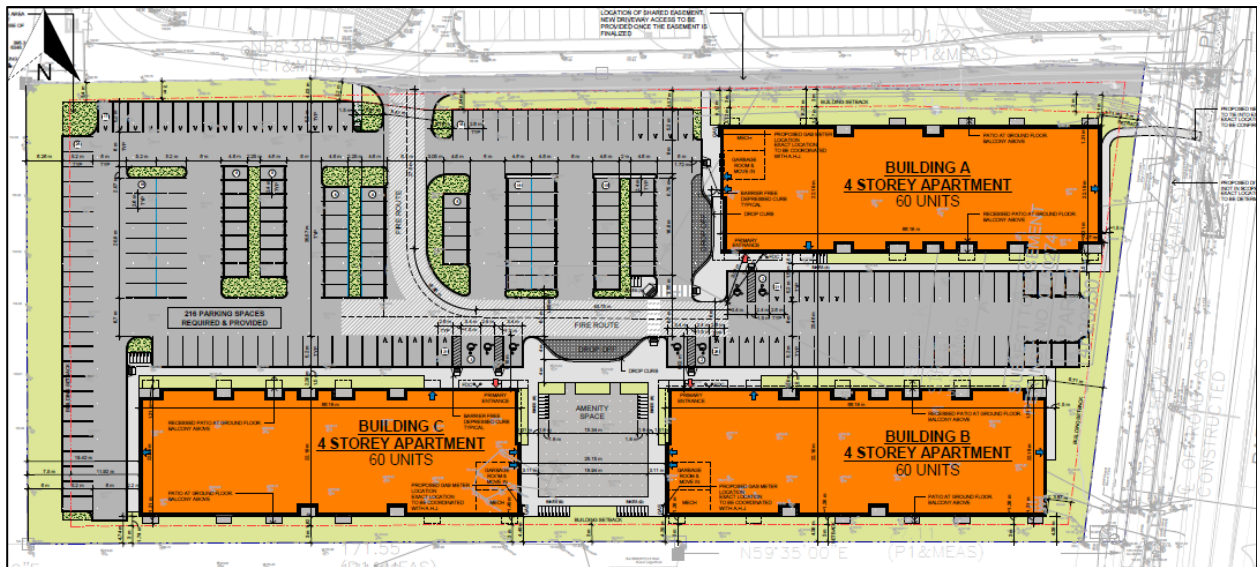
Excerpt of the Site Plan by Chamberlain Architect Services (May 19, 2022). Full Site Plan forms part of application
